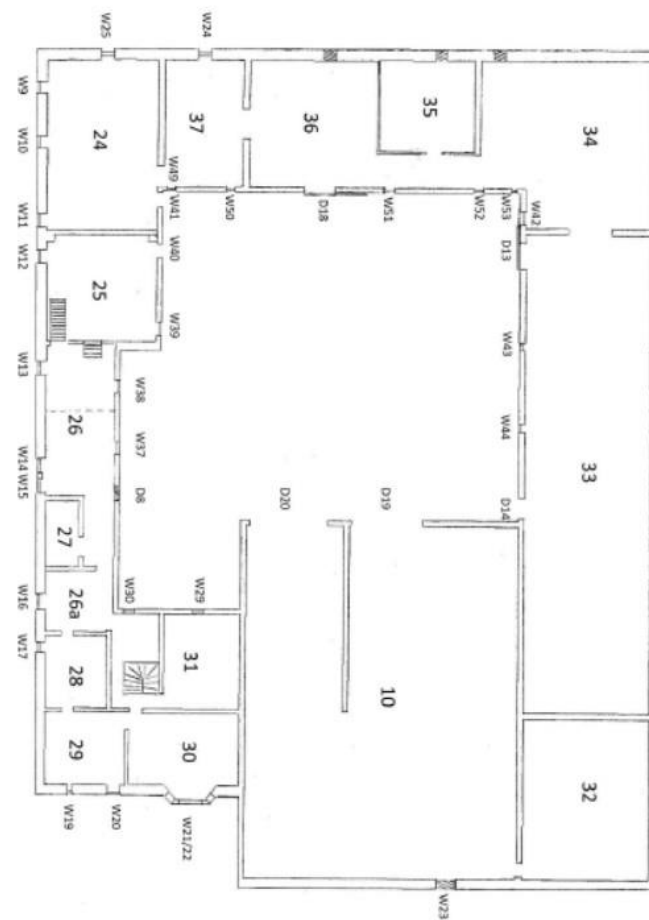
Existing First Floor Plan (courtesy of Robert Lenfert Archaeology)
